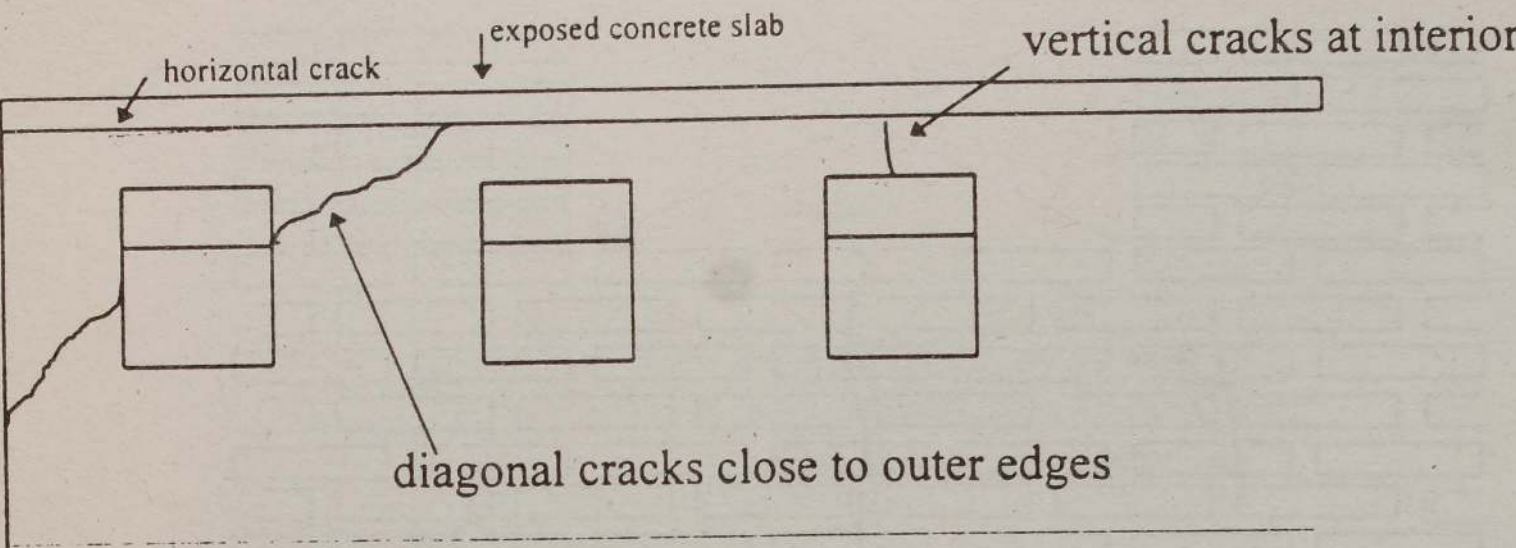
Vertical, horizontal and diagonal cracks in a load bearing wall supporting an exposed concrete slab.
